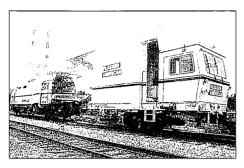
Flash butt welding equipment for in-track welding of rails
